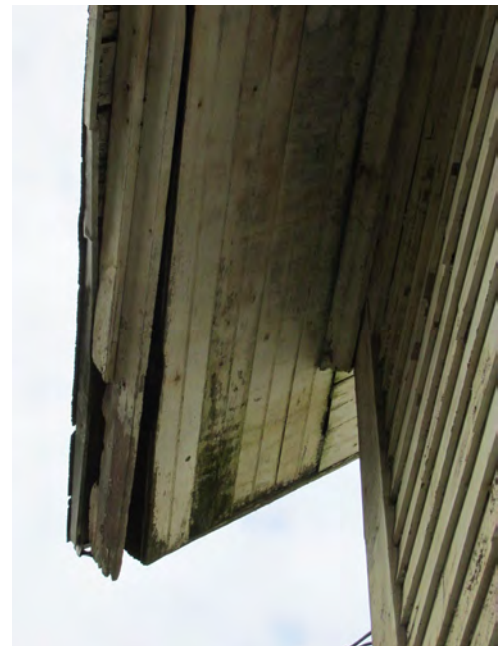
Damaged and rotted wood fascia and soffit boards. (HA, 2015)
